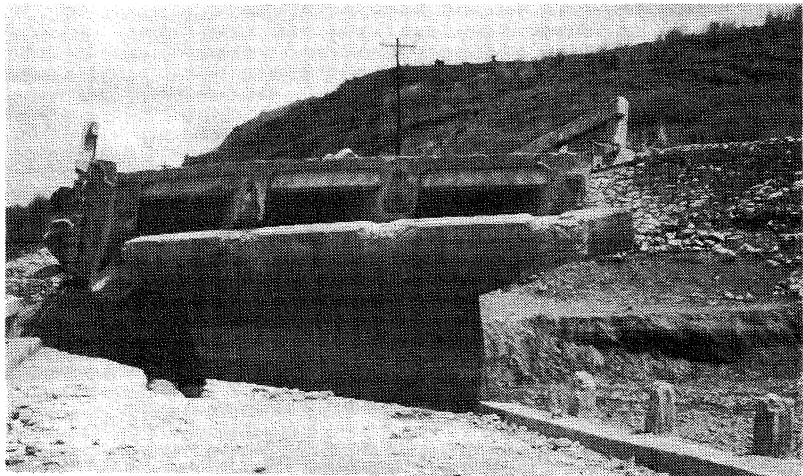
Rizal Canal Bridge; pier rotation and collapse of deck, view towards north west. Initial demolition work had commenced with removal of the handrail and cutting a slot in the deck
